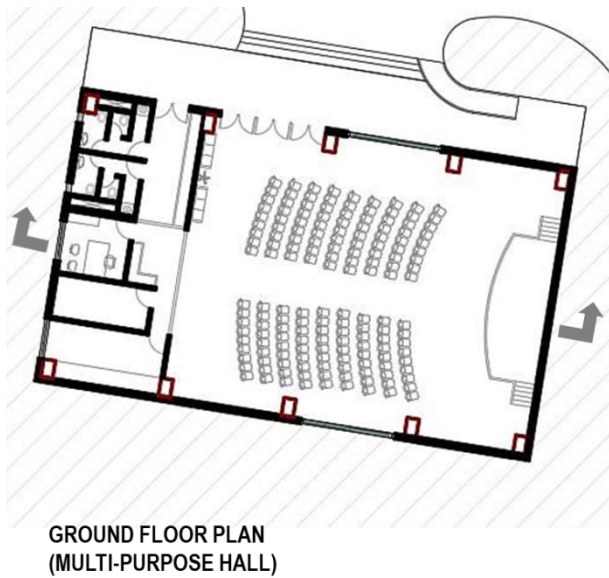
Multi-purpose hall plan ;(Source: Author,2020)
